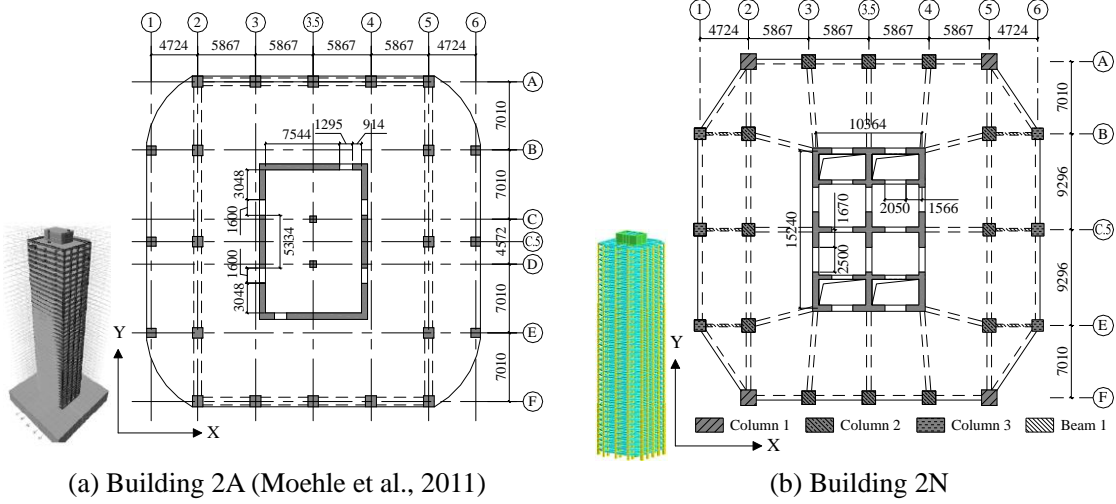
3D view and typical floor plan of Buildings 2A and 2N (units: mm)
